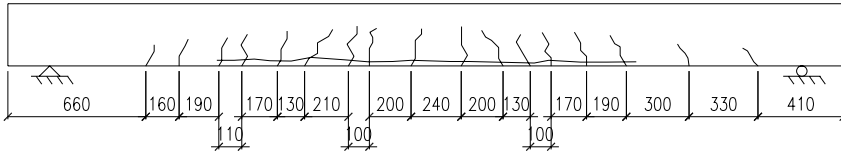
Longitudinal view of corroded beam with crack pattern after failure load test.
